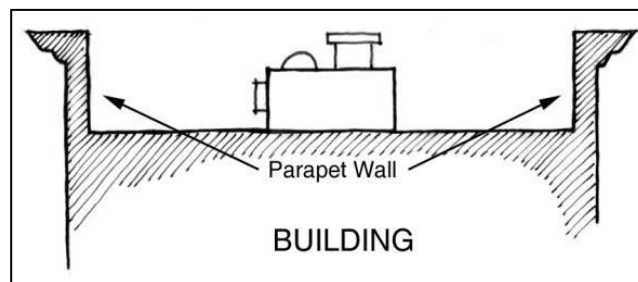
H: Example of how parapet walls are utilized to screen roof mounted mechanical equipment.
